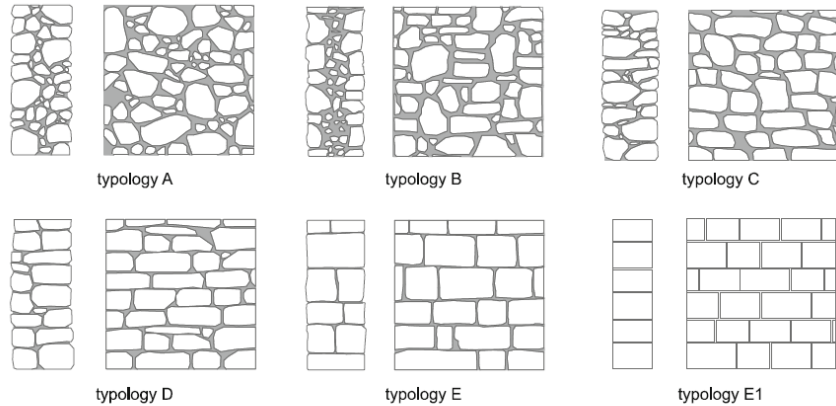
Stone masonry typologies: sketches of typical textures and cross-sections
